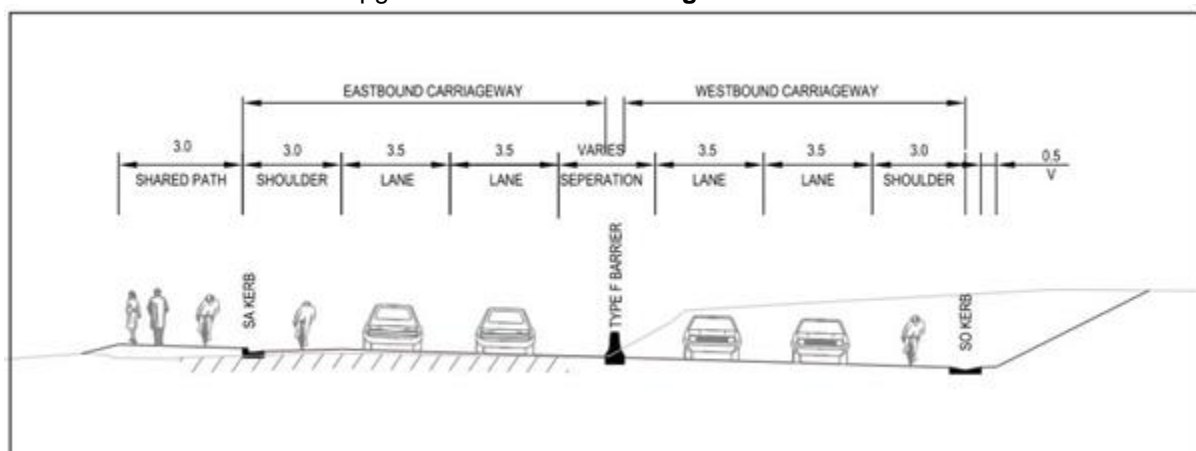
Typical cross-section of Mona Vale Road Upgrade West
